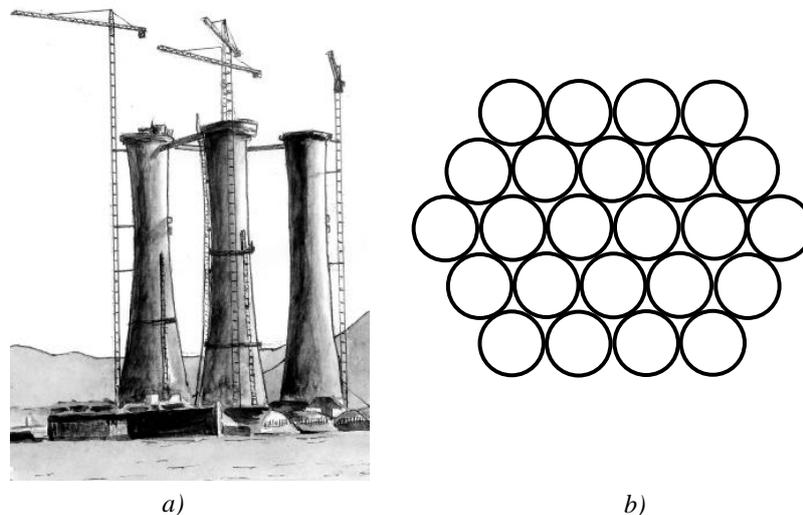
The offshore platform Sleipner a) during construction, b) plan section of cell structure. Figure a) is taken from and figure b) is based on Whittle (2013).
